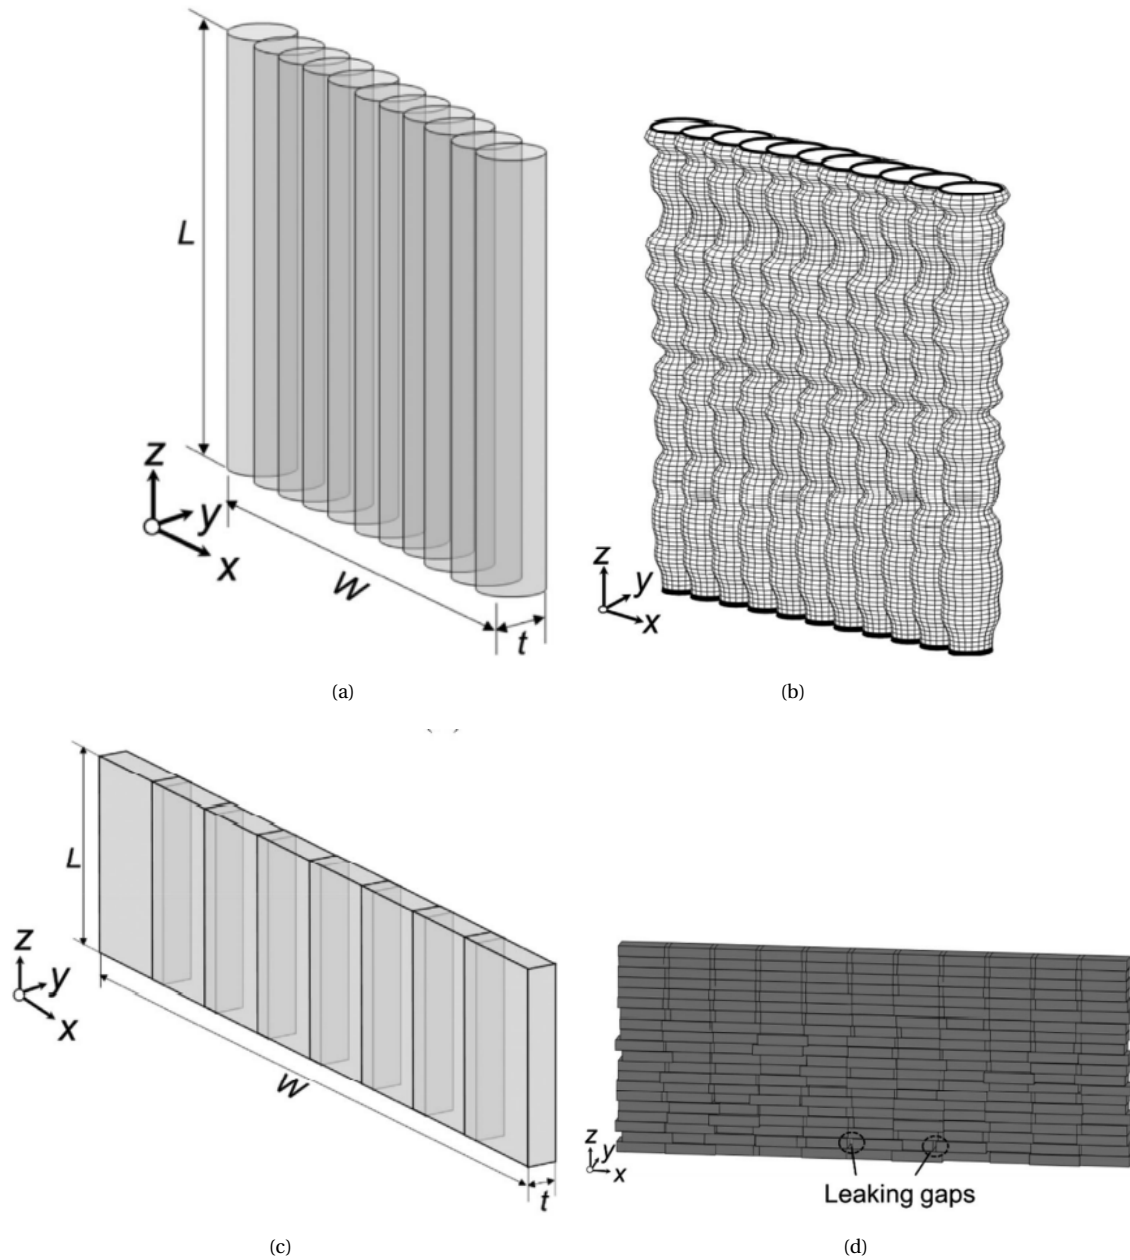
Two widely used cutoff walls : (a) jet-grouted cutoff wall (perfect); (b) jet-grouted cutoff wall (with defects); (c) diaphragm wall (perfect); (d) diaphragm wall (with defects) (Pan et al., 2021)
